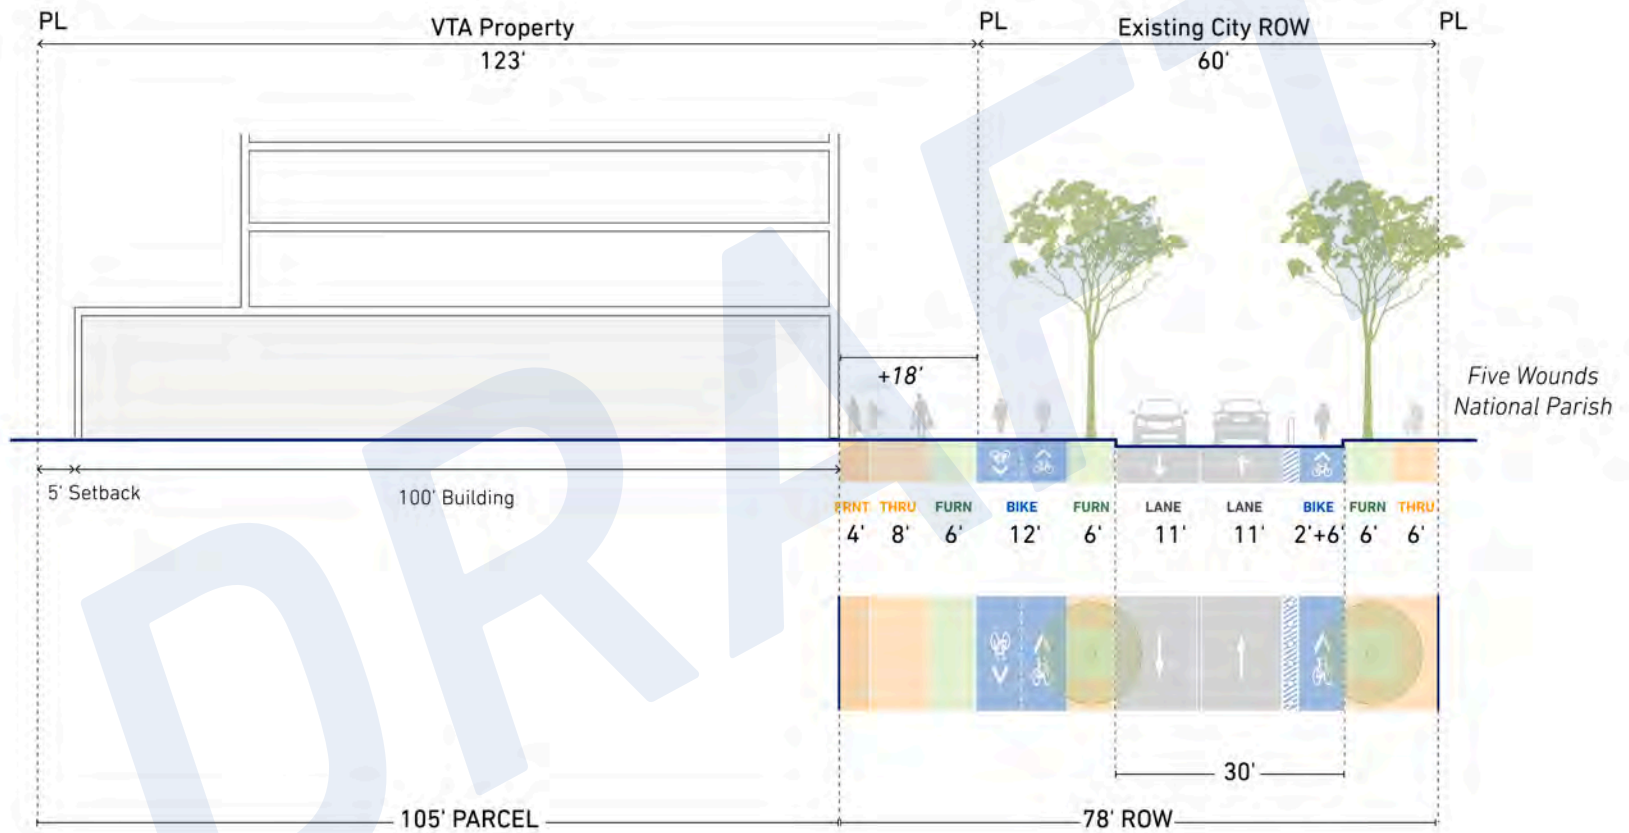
Conceptual N. 28th Street section #1 near E. Julian Street with separated sidewalk and bikeway
